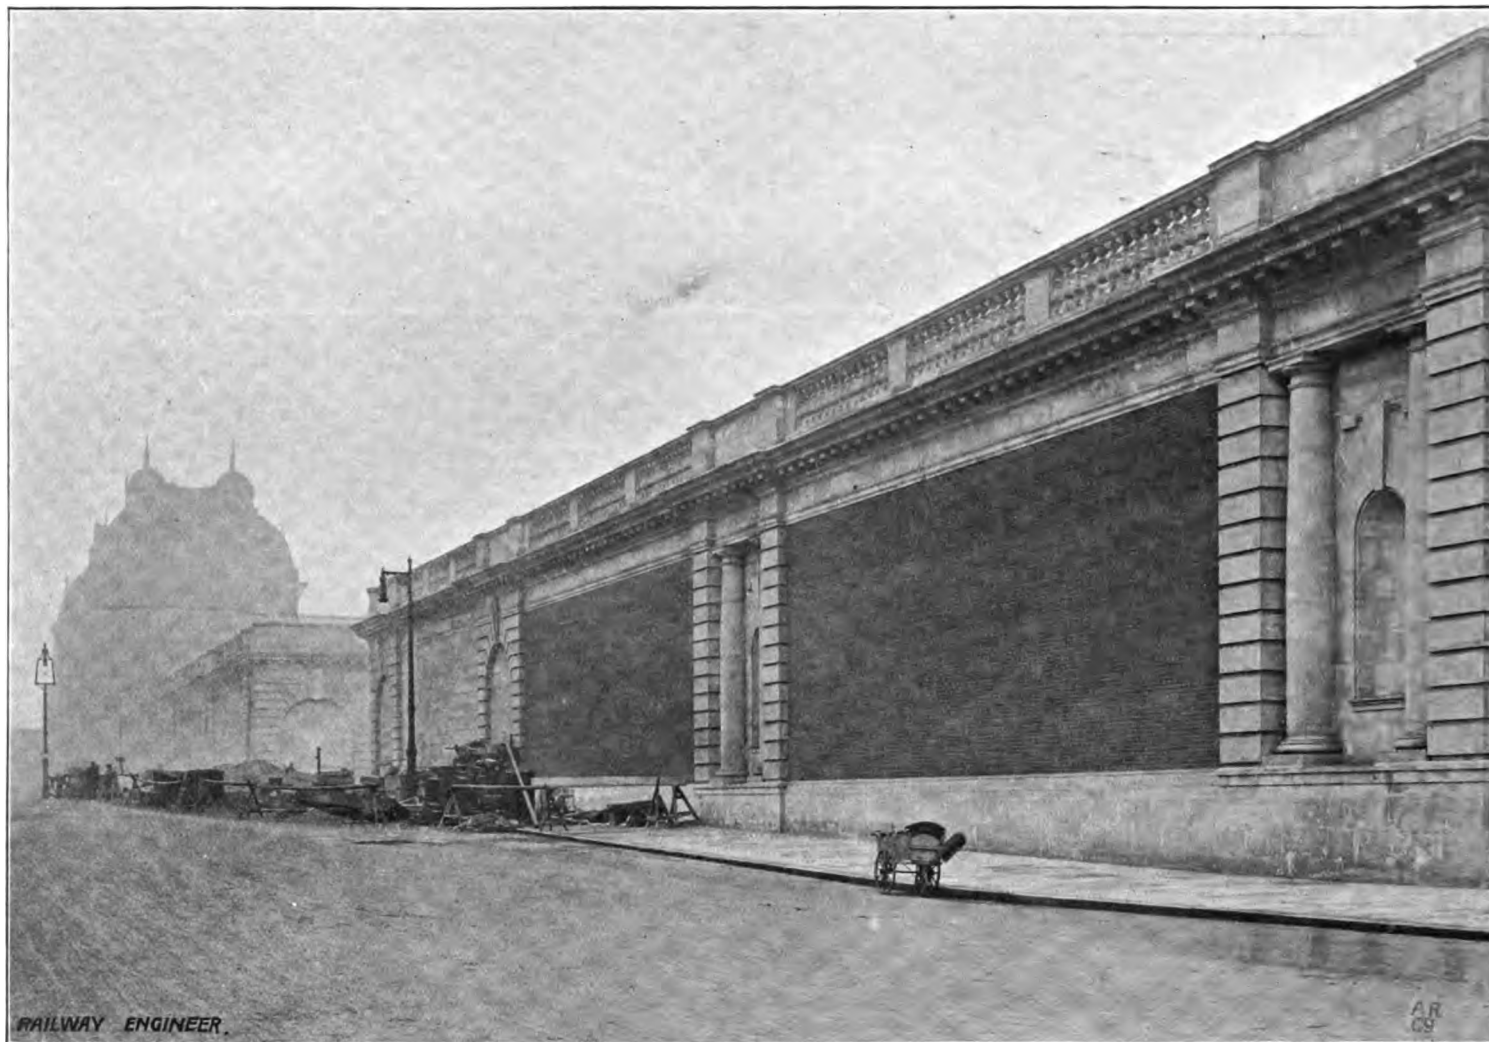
Boundary Wall, Buckingham Palace Road.
